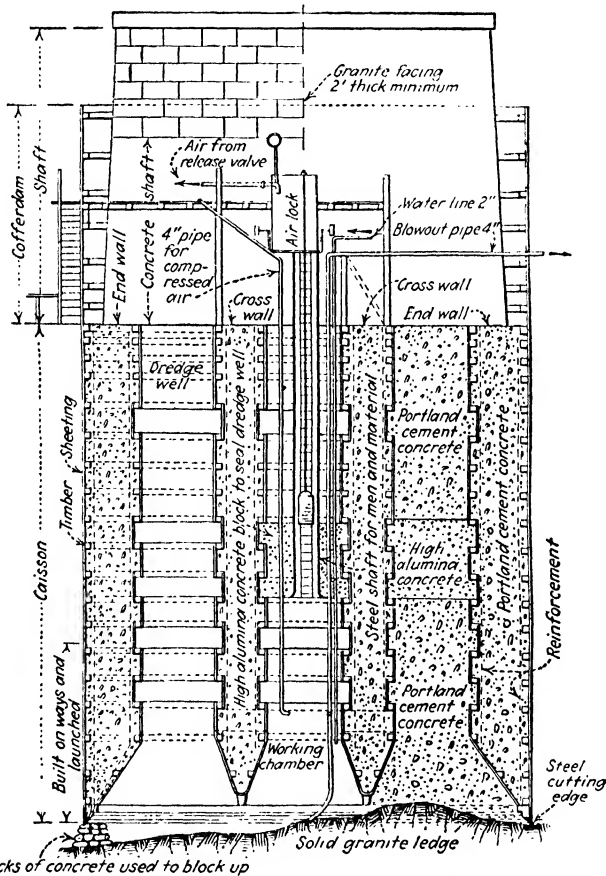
Concrete Caisson of Kennebec River Bridge at Bath, Me.
